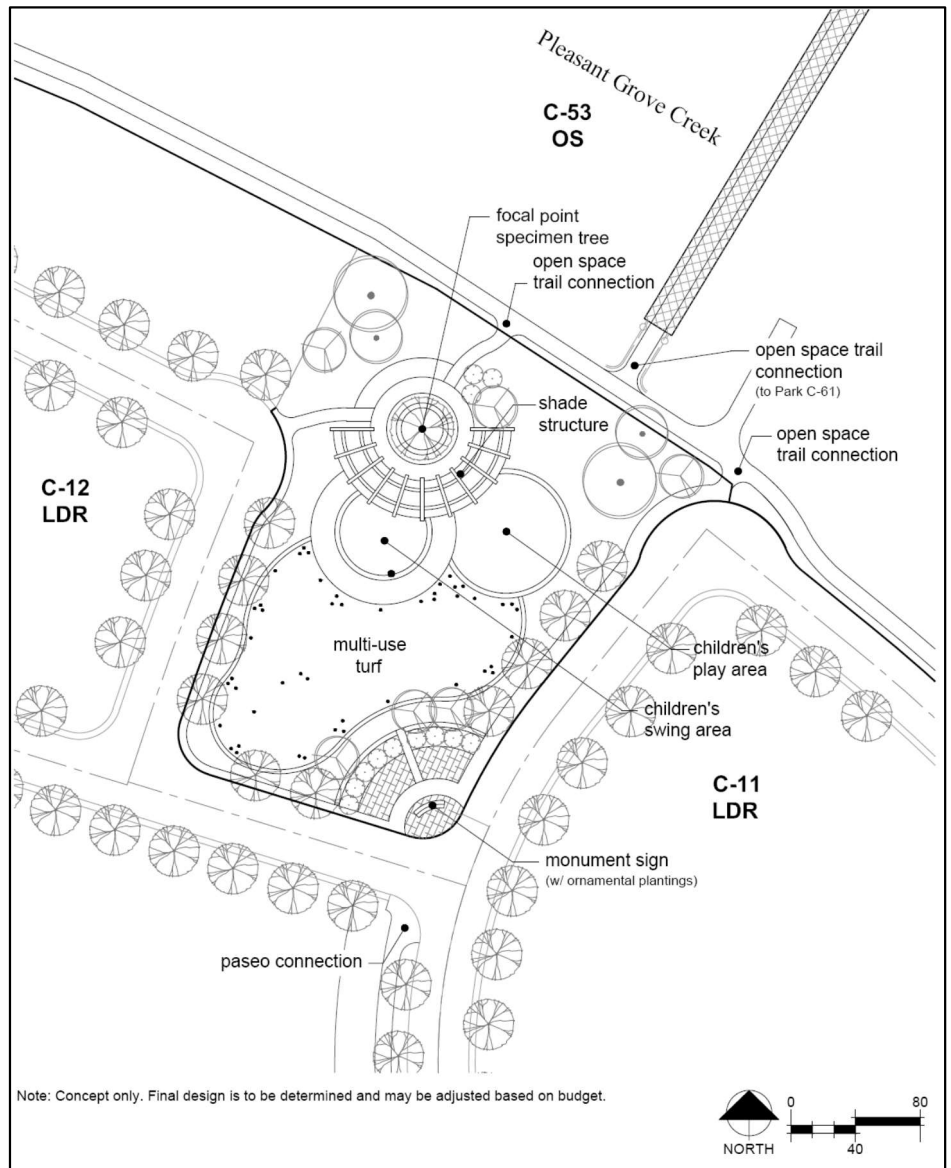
Concept Plan for Neighborhood Park (C-62)
